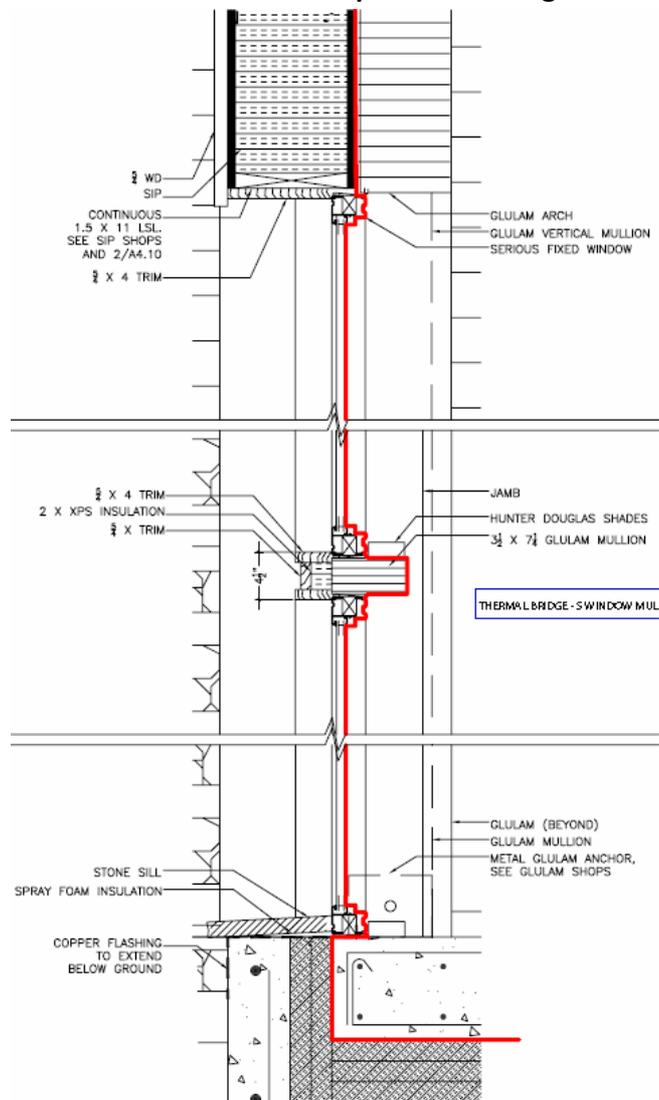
Vertical section through south curtain wall glazing including sill at slab, intermediate mullion and window head (red lines define air infiltration barrier)
